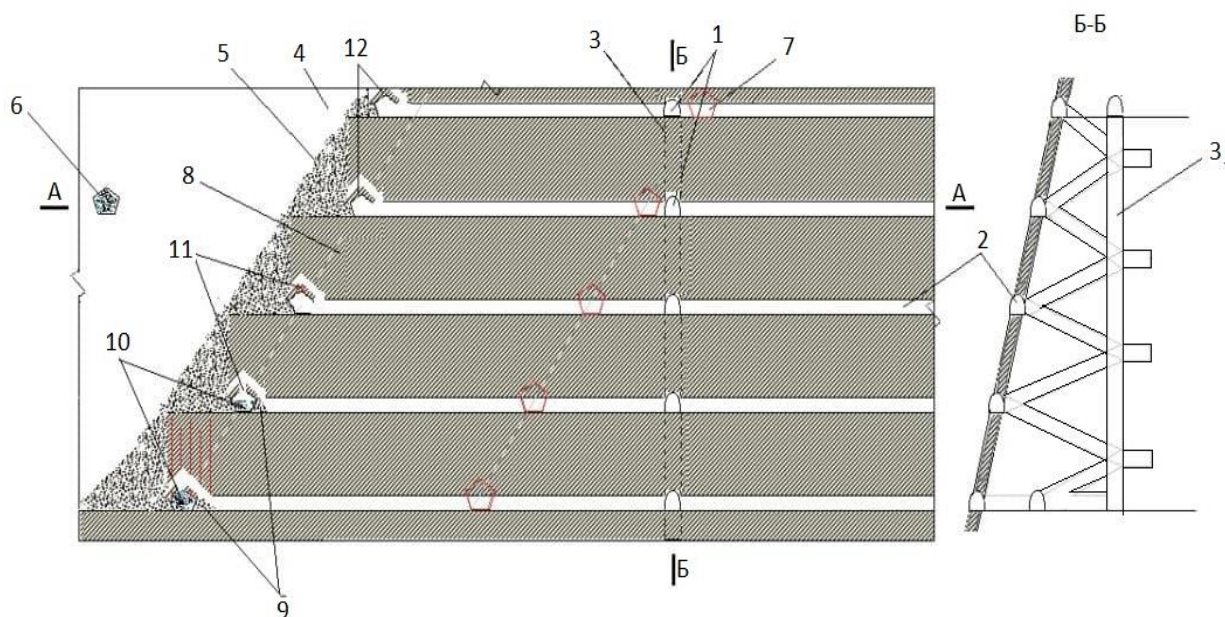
Sublevel mining system with artificial pillars of polygonal shape from the hardening fill: 1- crosscut to the ore pass; 2- sublevel drift; 3- ore pass; 4- open developed space; 5 - broken ore; 6- artificial polygonal pillar; 7 - the place where the next pillar of polygonal shape was laid; 8- solid ore; 9- a partition from an ore embankment; 10- the position of the excavation (vessels) for the pillar device, in the stage of its construction; 11 - the position of the excavation (vessels) at the stage of formation of the pillar, 12 - the position of the excavation with overlap (ore embankment) before laying the pillar; 13- drilled wells.
